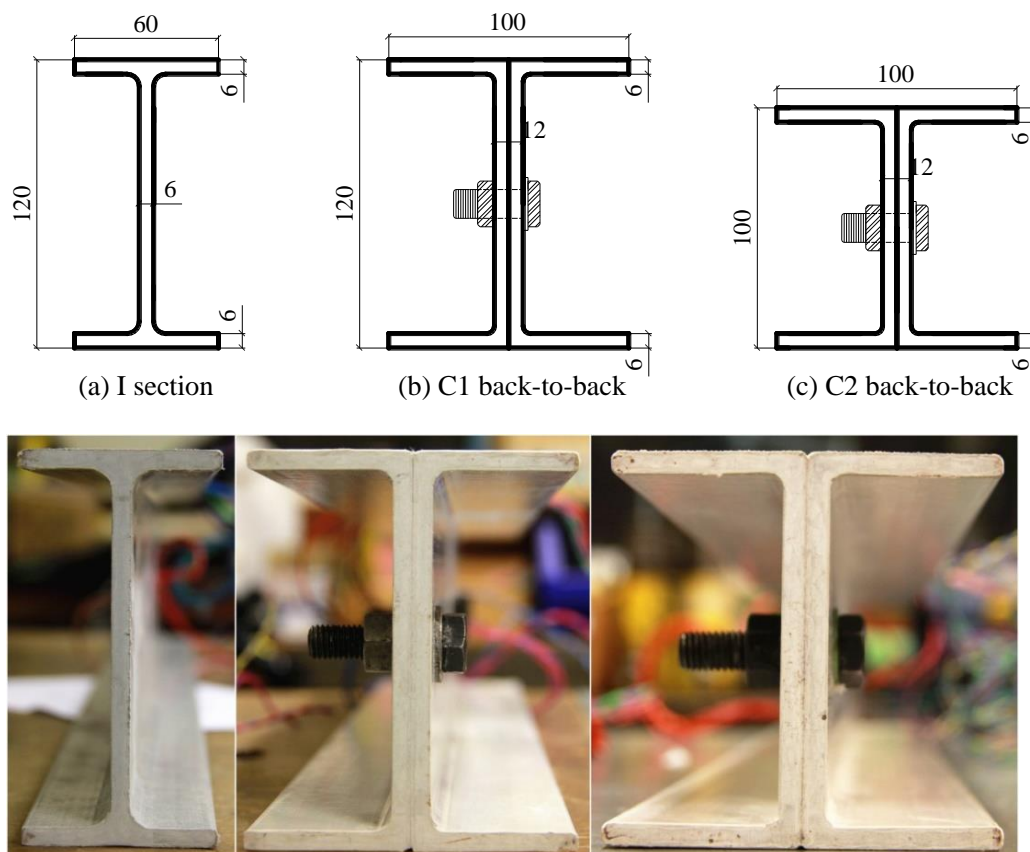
Drawing (top) and photo (bottom) for specimen: (a) I; (b) C1; (c) C2.
